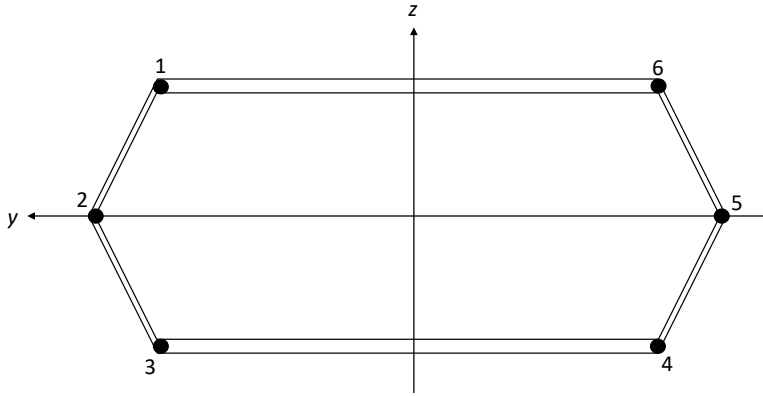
Bridge girder cross section with locations for stress calculations.
